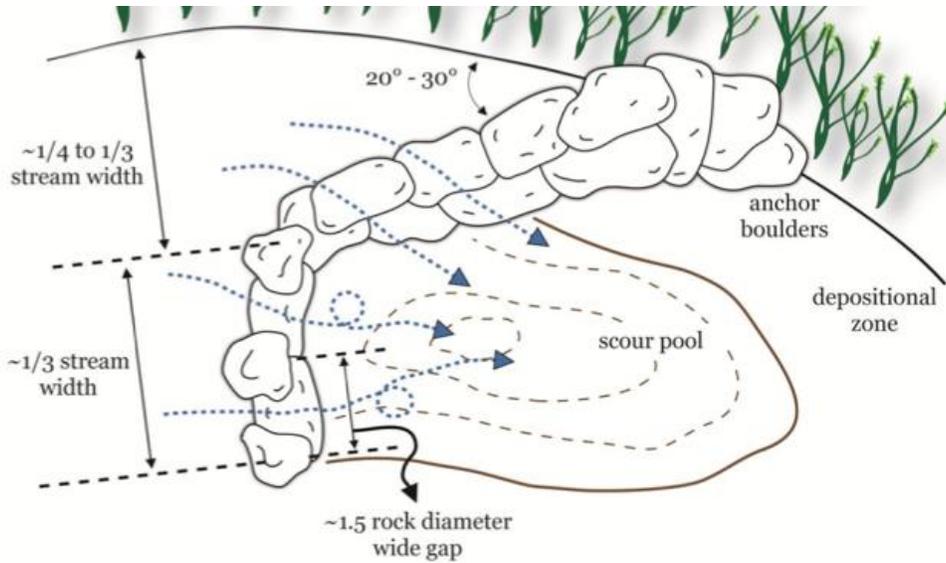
Bendway Weir Plan View (Lagasse et al., 2009b).
